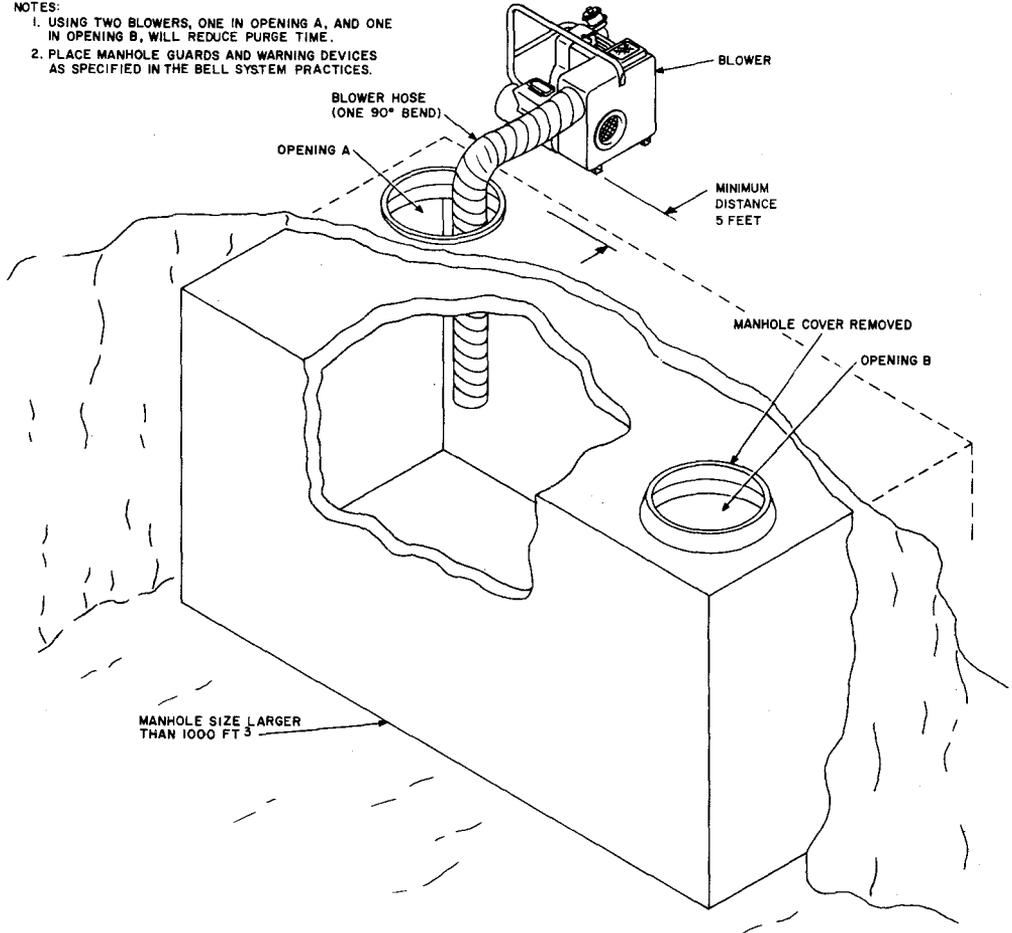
Typical Setup for Purging Large Conventional Manholes
